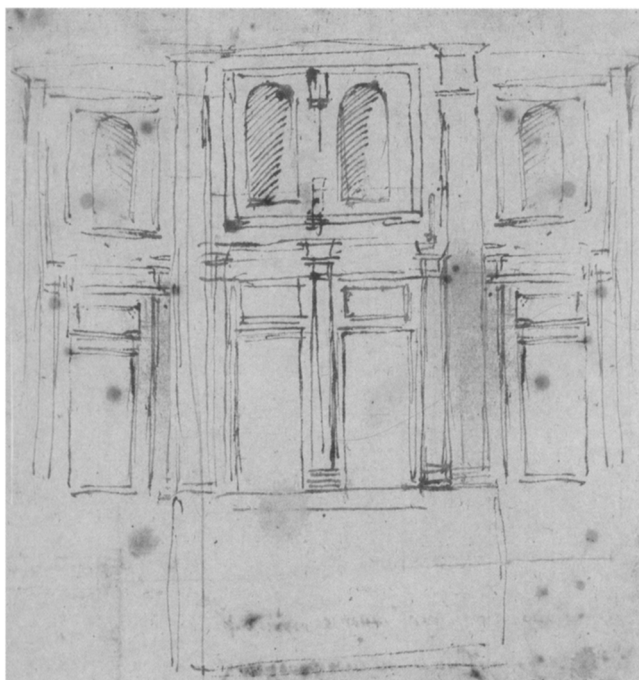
Michelangelo, Casa Buonarroti 89A recto, elevational study for the south wall of the Laurentian Library ricetto, with right bay mirrored to the left side of the central double bay, to suggest a completed elevation, and with the sketch plan from Casa Buonarroti 89A verso rotated and projected below the elevation (Photoshop manipulations: author)
